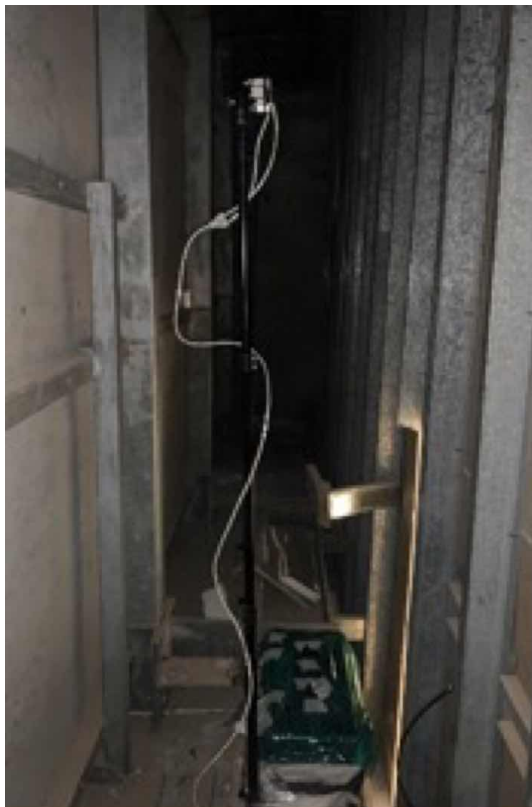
Sealing Station Inside Ext. Wall Cavity
